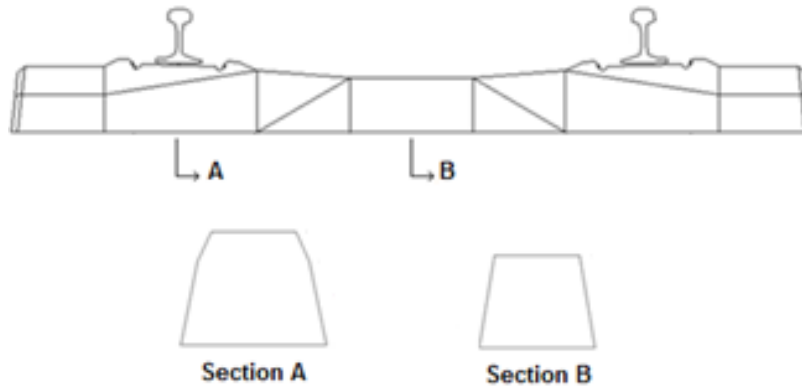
Longitudinal profile and cross-section dimensions of the tie in mm.
